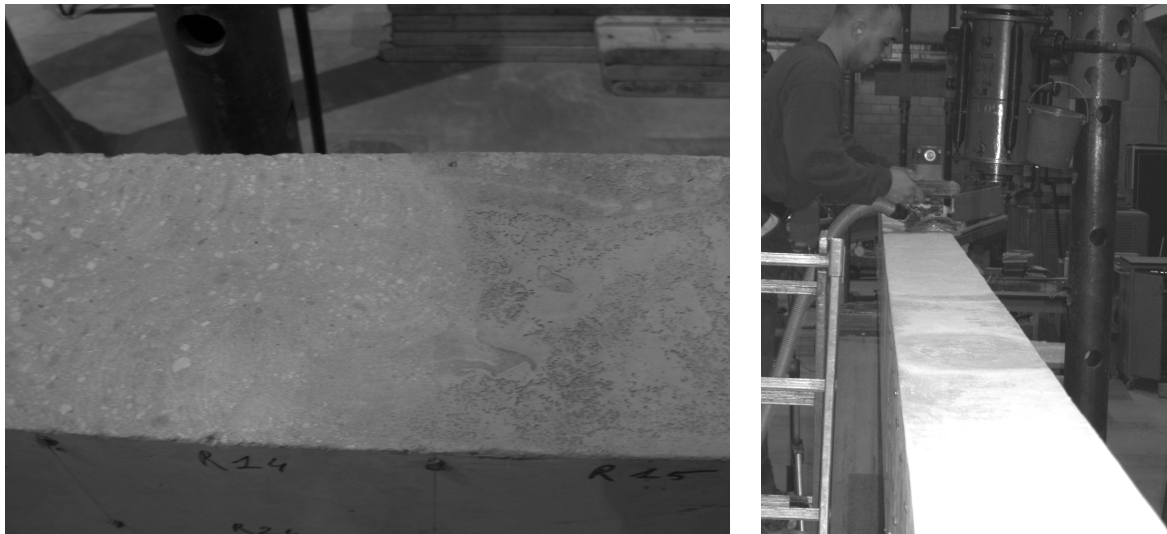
Preparation of concrete surface before application of FRP-laminates
